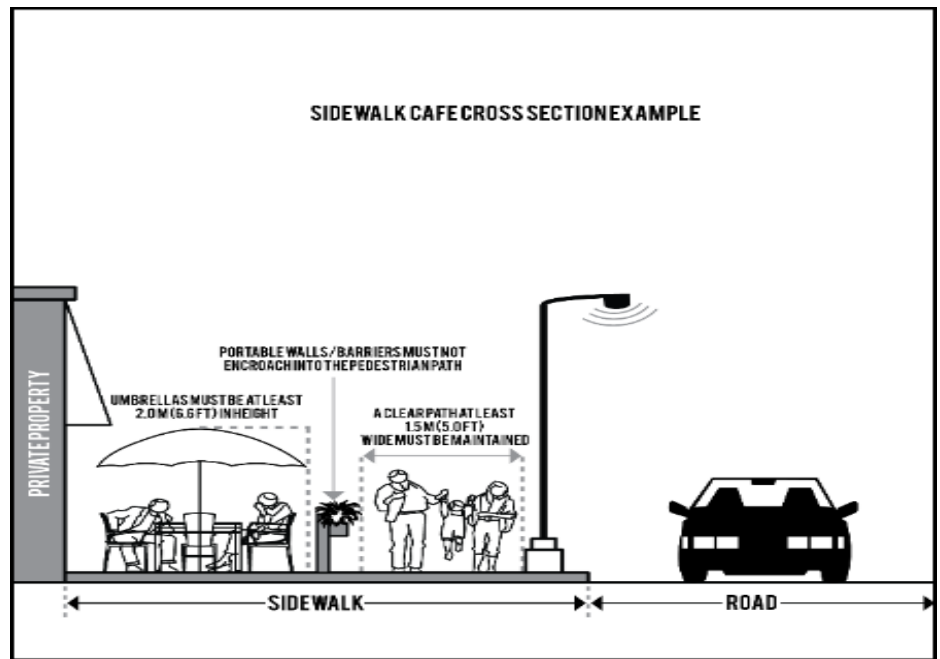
EXAMPLE SIDEWALK CAFE CROSS SECTION
